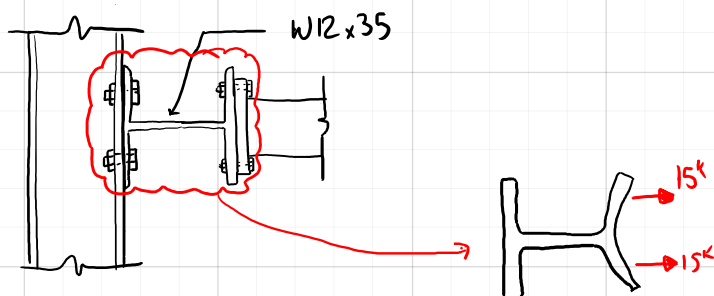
PLATE BENDING CALLSFOUNDATION CONNECTION ASSEMBLYW12x35 COLUMN
